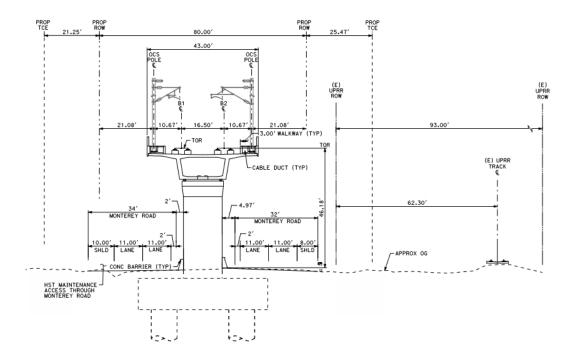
Typical Section in Subsection Monterey Corridor (Viaduct
